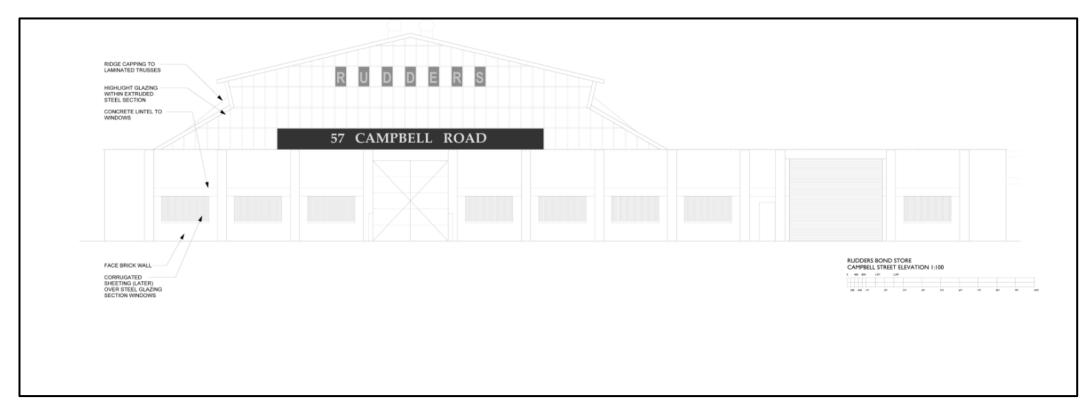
Elevation plan of the front façade. (Source: The Archivist, Drawing No RBS_MD-02, Issue 21.07.16).
